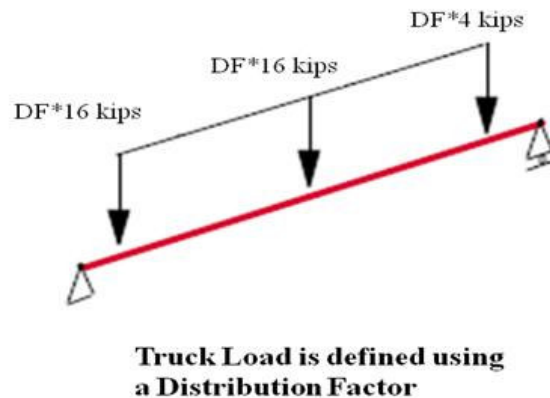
AASHTO Modeling a T-beam Bridge with HS20 Truck Loading for Load Rating
